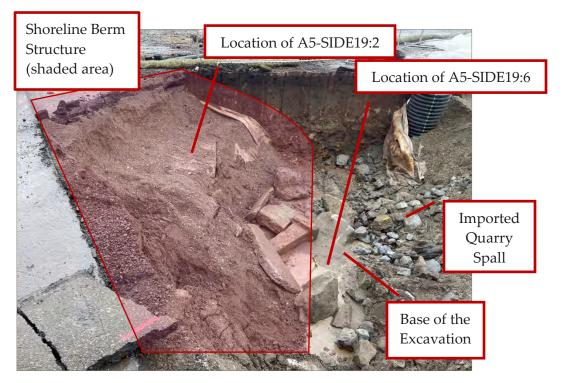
Extent of Excavation at the Northwest Corner of Area 5. View direction is north.
